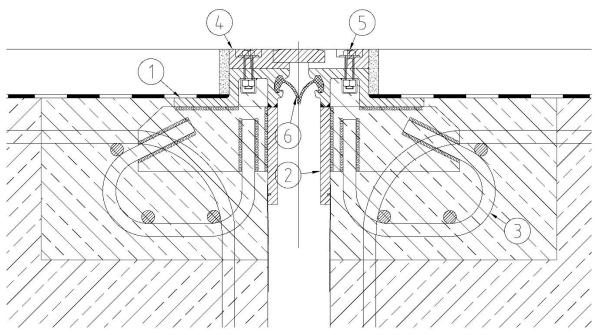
Exemplary cross section of the nosing expansion joint Fahrbahnübergangskonstruktion Typ SP/FP, including anchor loop, pavement thickness 75 mm
